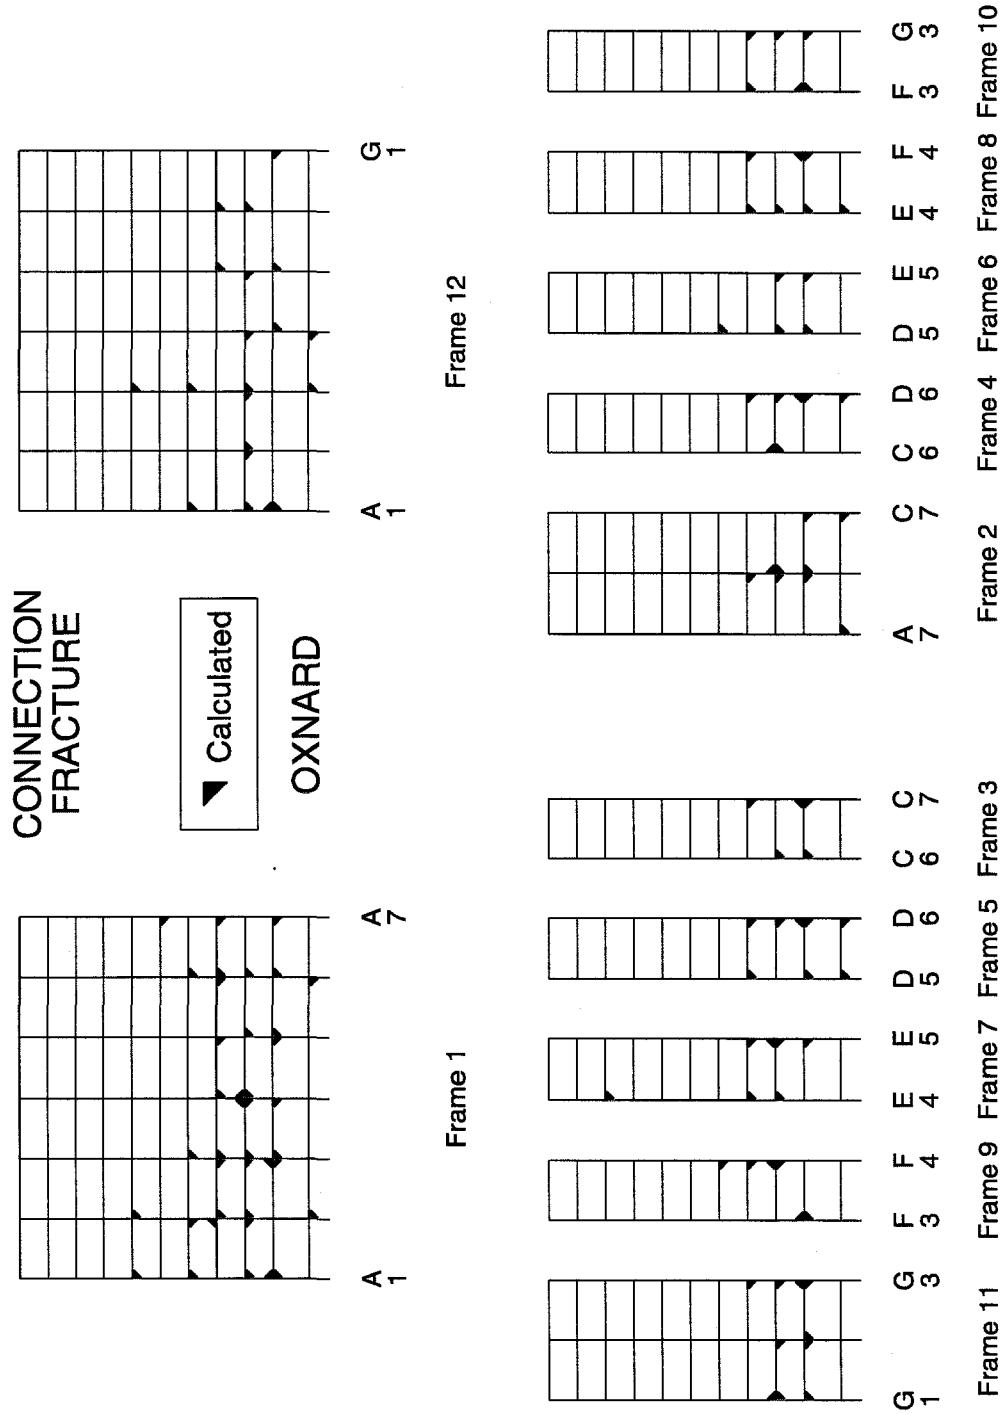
Fracture of member ends, Oxnard rotated 0°.
